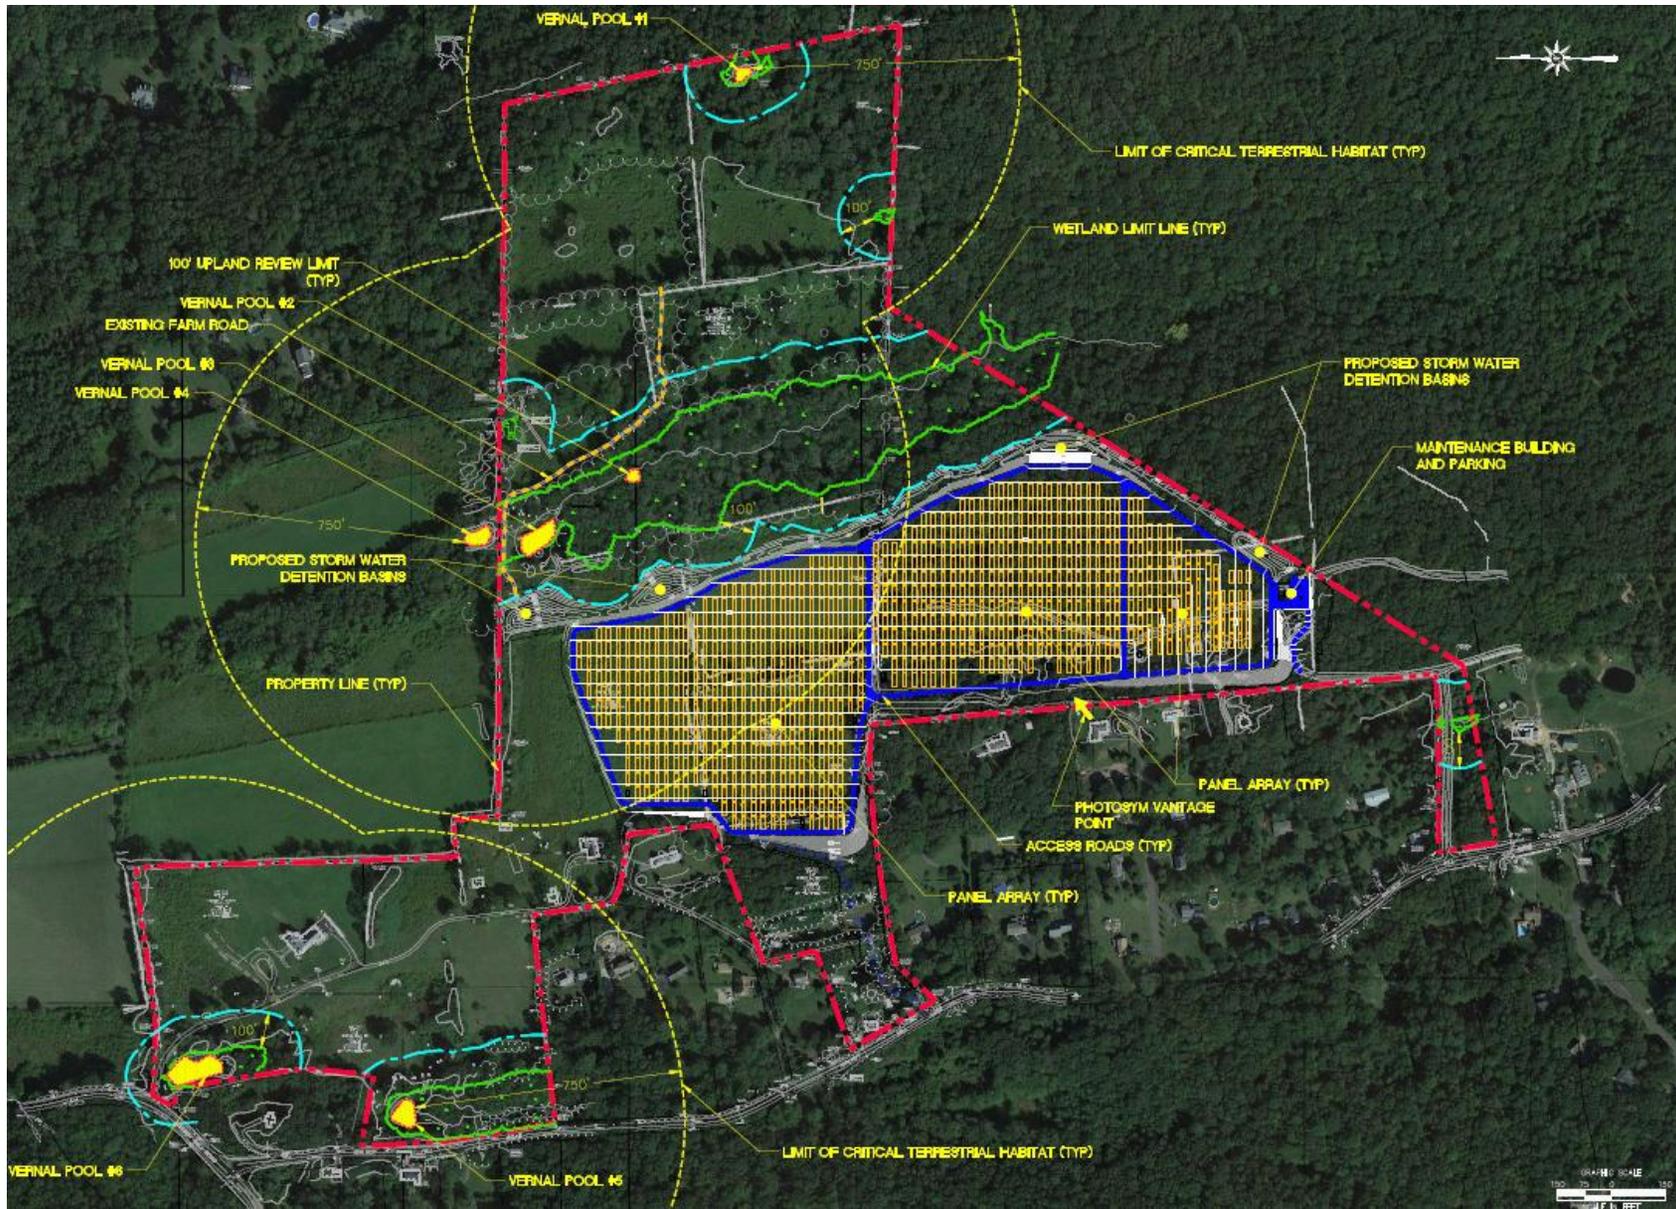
Existing Site Conditions and Proposed Solar Field. (GRE 7).
